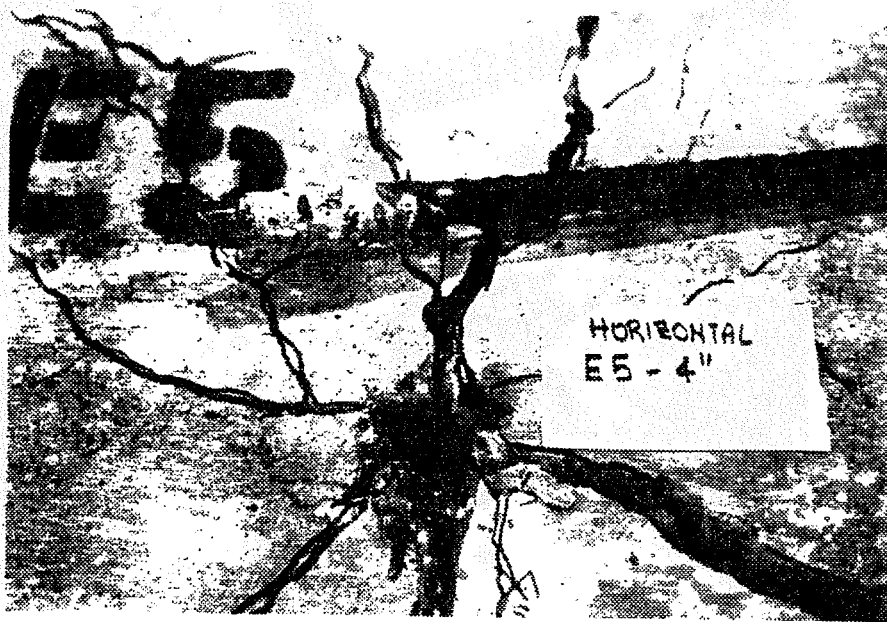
Typical splitting failure. Brand 1 plus sand (grade 2). Horizontal grouting.
